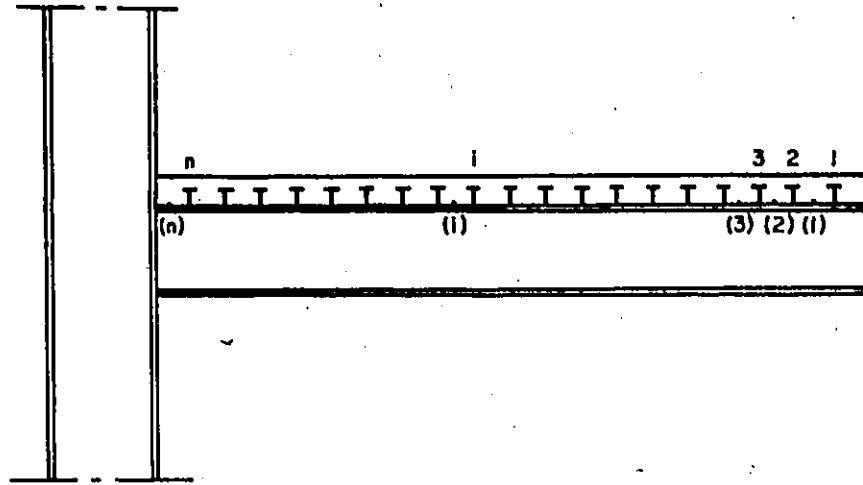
a COMPOSITE BEAM SHOWING CONNECTORS AND PANELS
